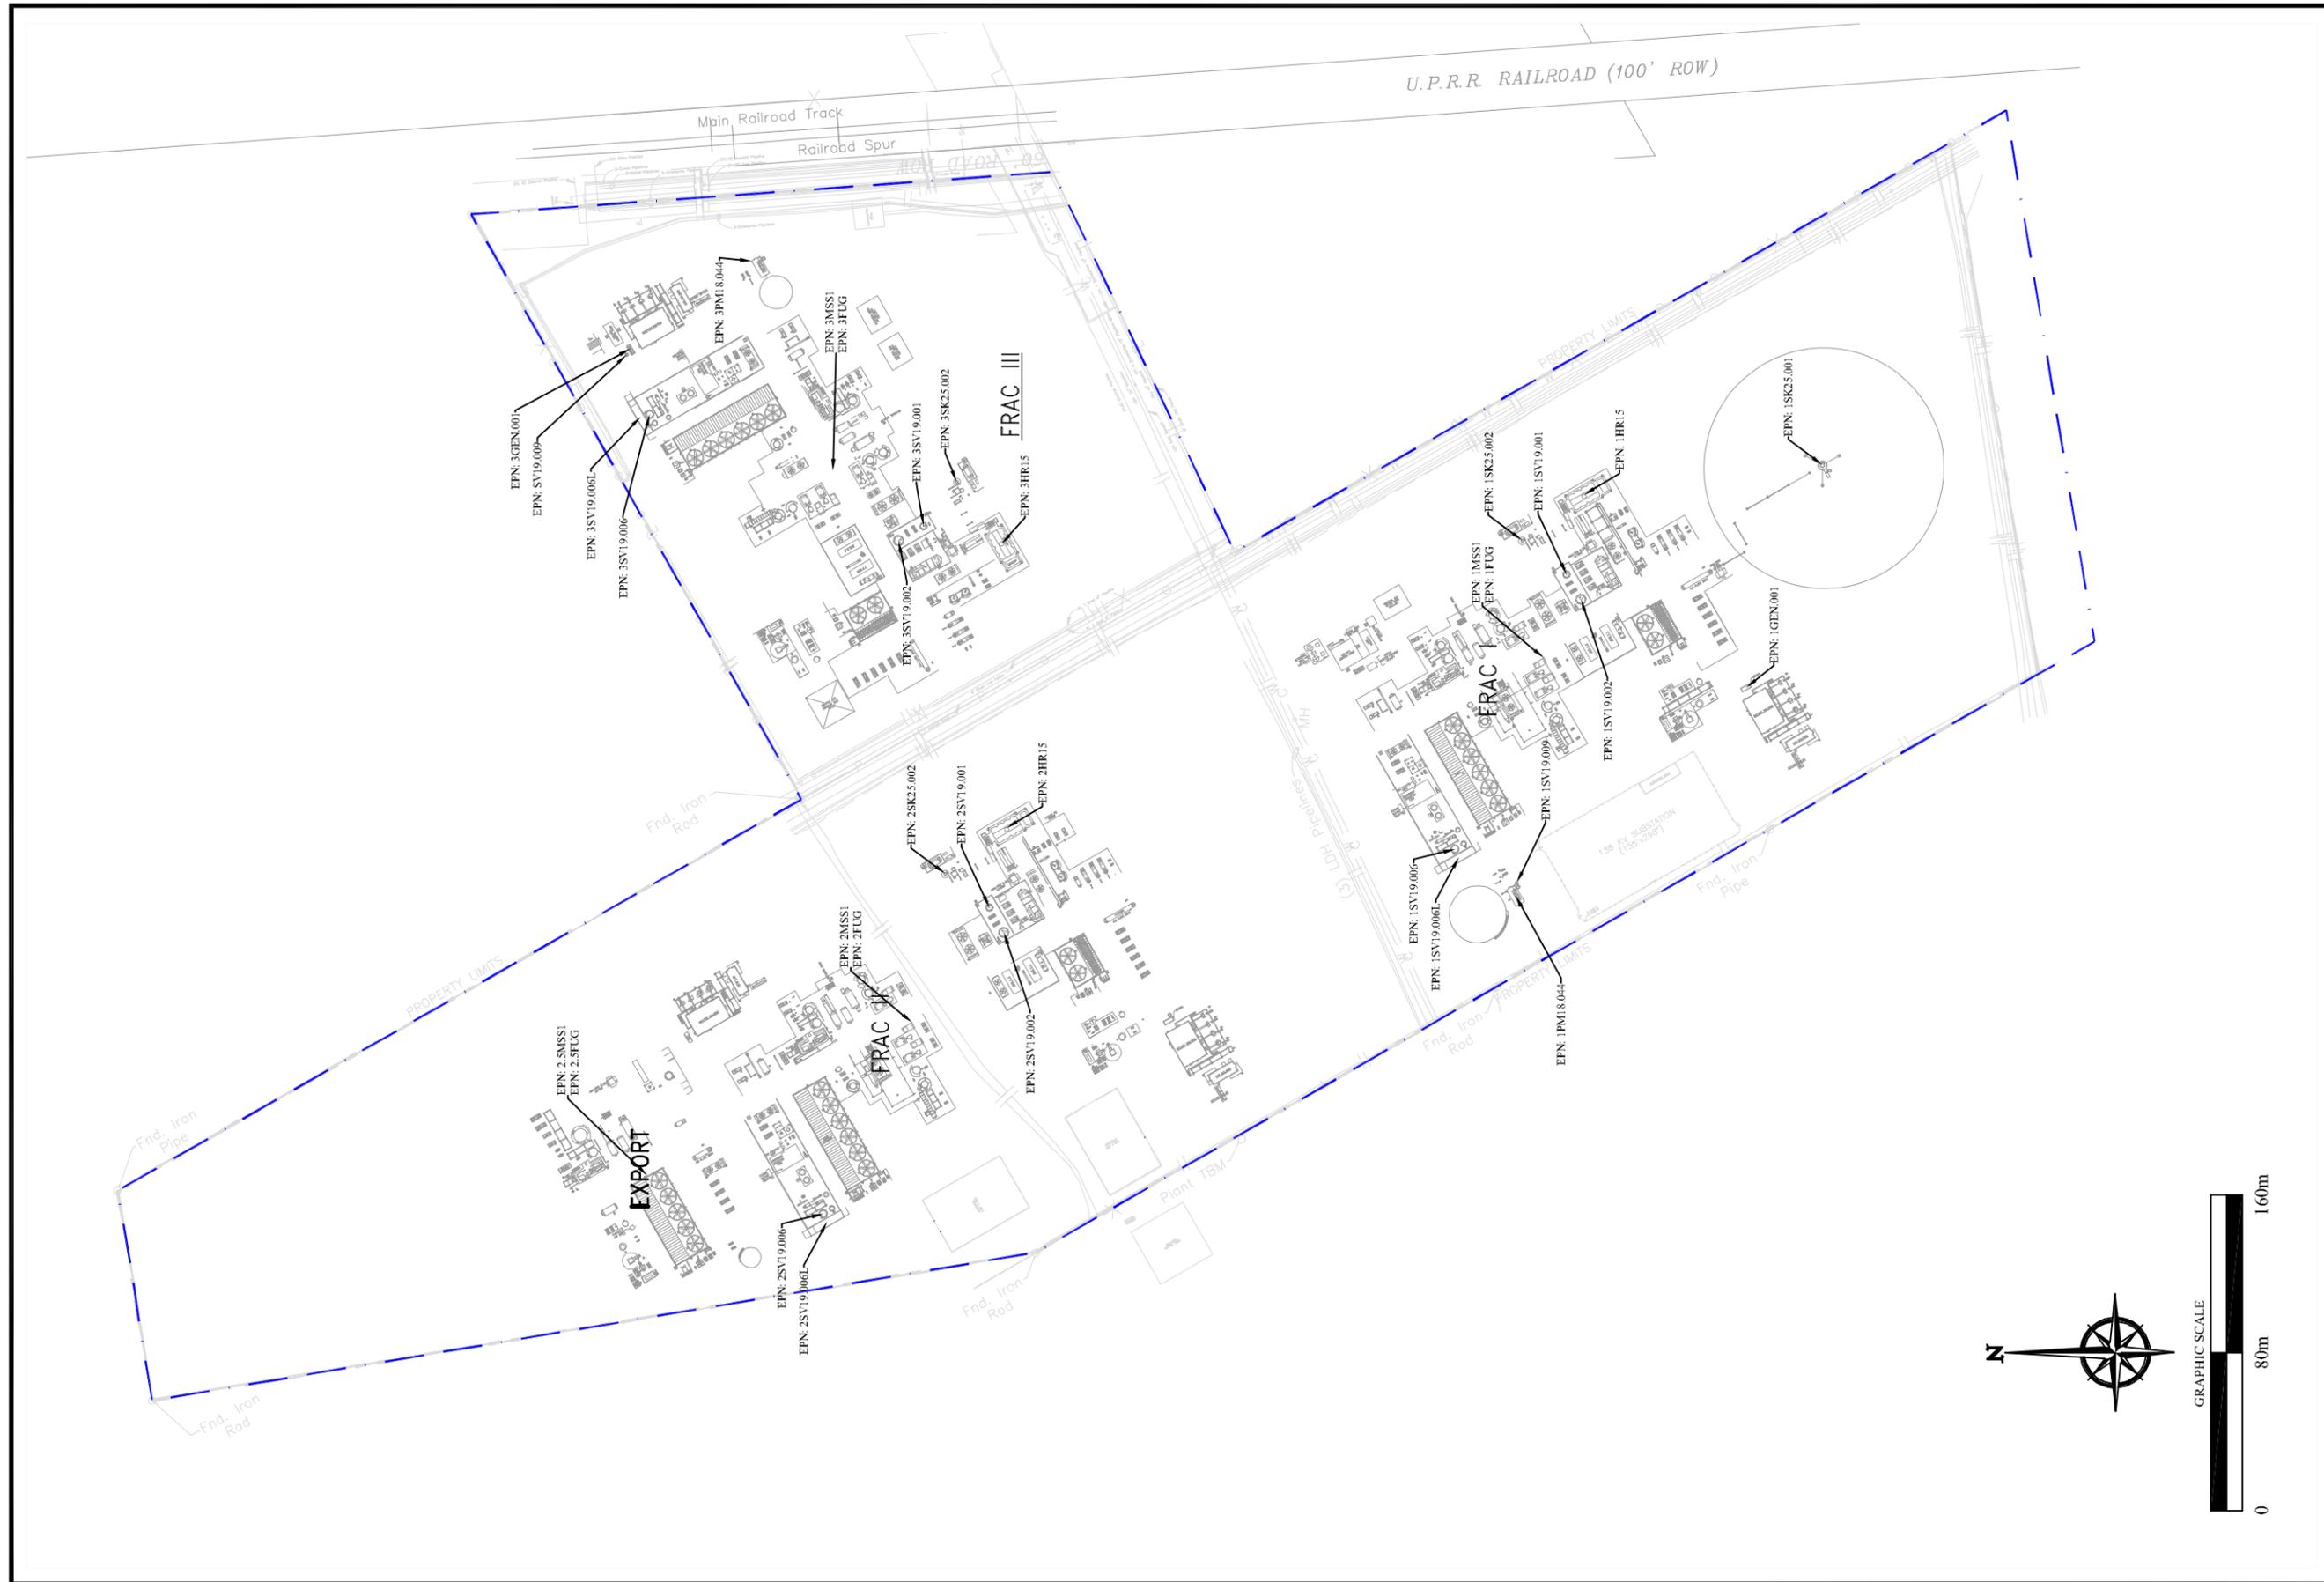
PRELIMINARY SITE LAYOUT
